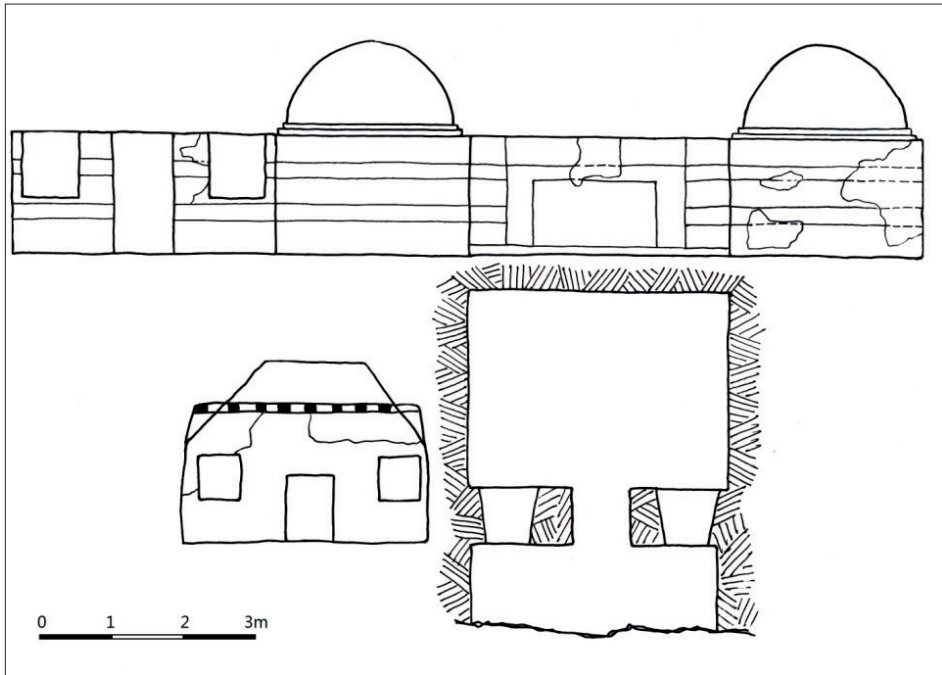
Cave 118. Below: plan and view of the restored façade. Above: the disposition of the paintings on the four walls of the main chamber (starting from the left): front wall, right wall, main wall, left wall
